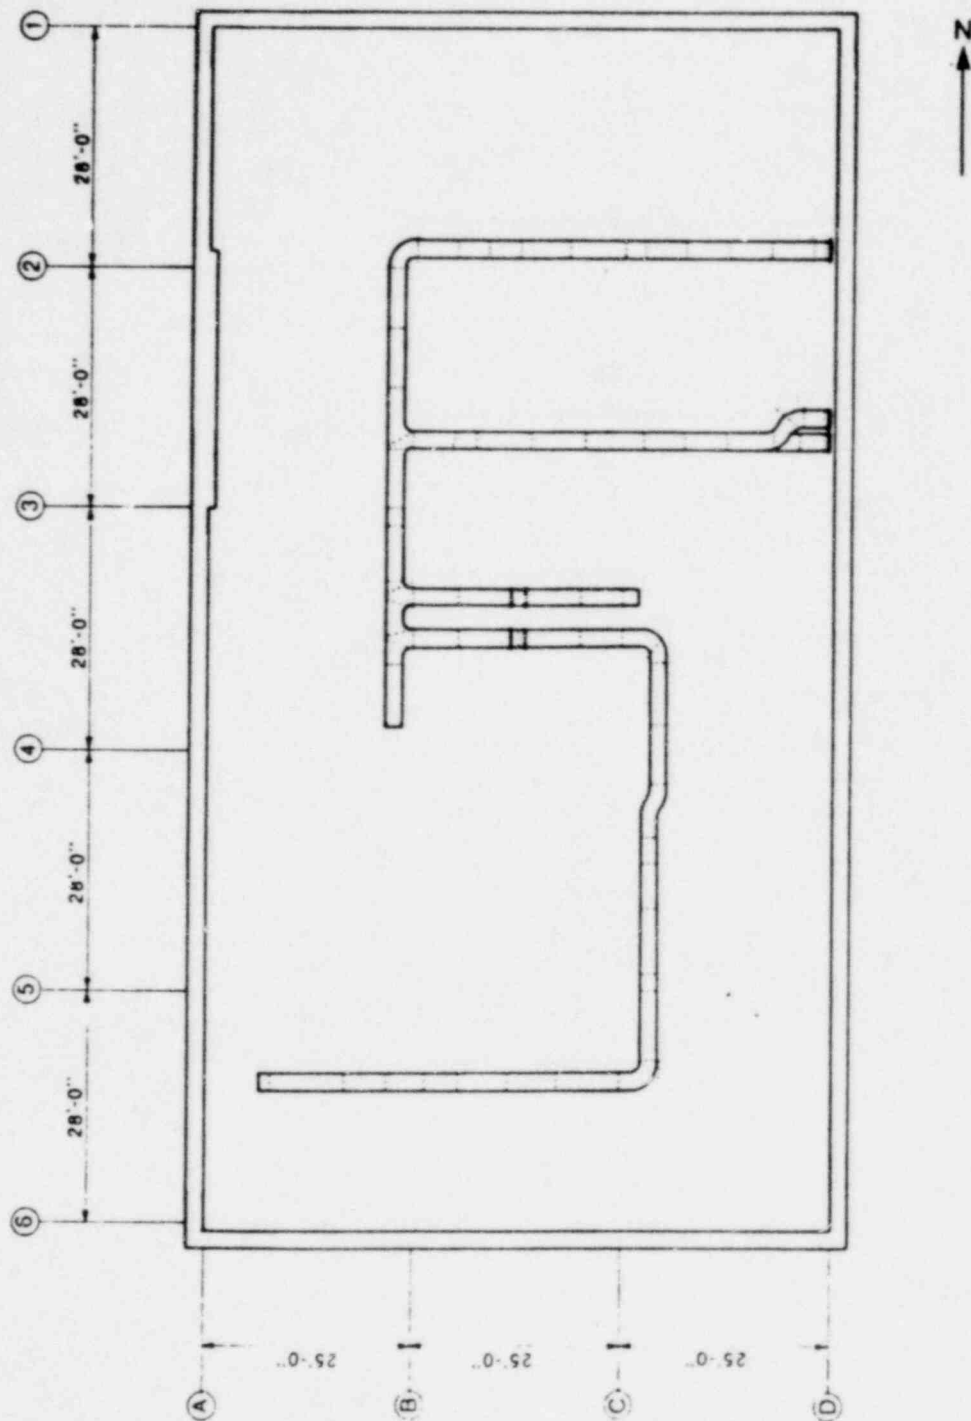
In this area, cable trays are mounted around the perimeter of the building in a 3-tier trapeze configuration. The supports are welded to the overhead structural steel wide-flange beams of the ceiling. In addition to the trapeze supports, some of the cable trays are supported on pedestals.
